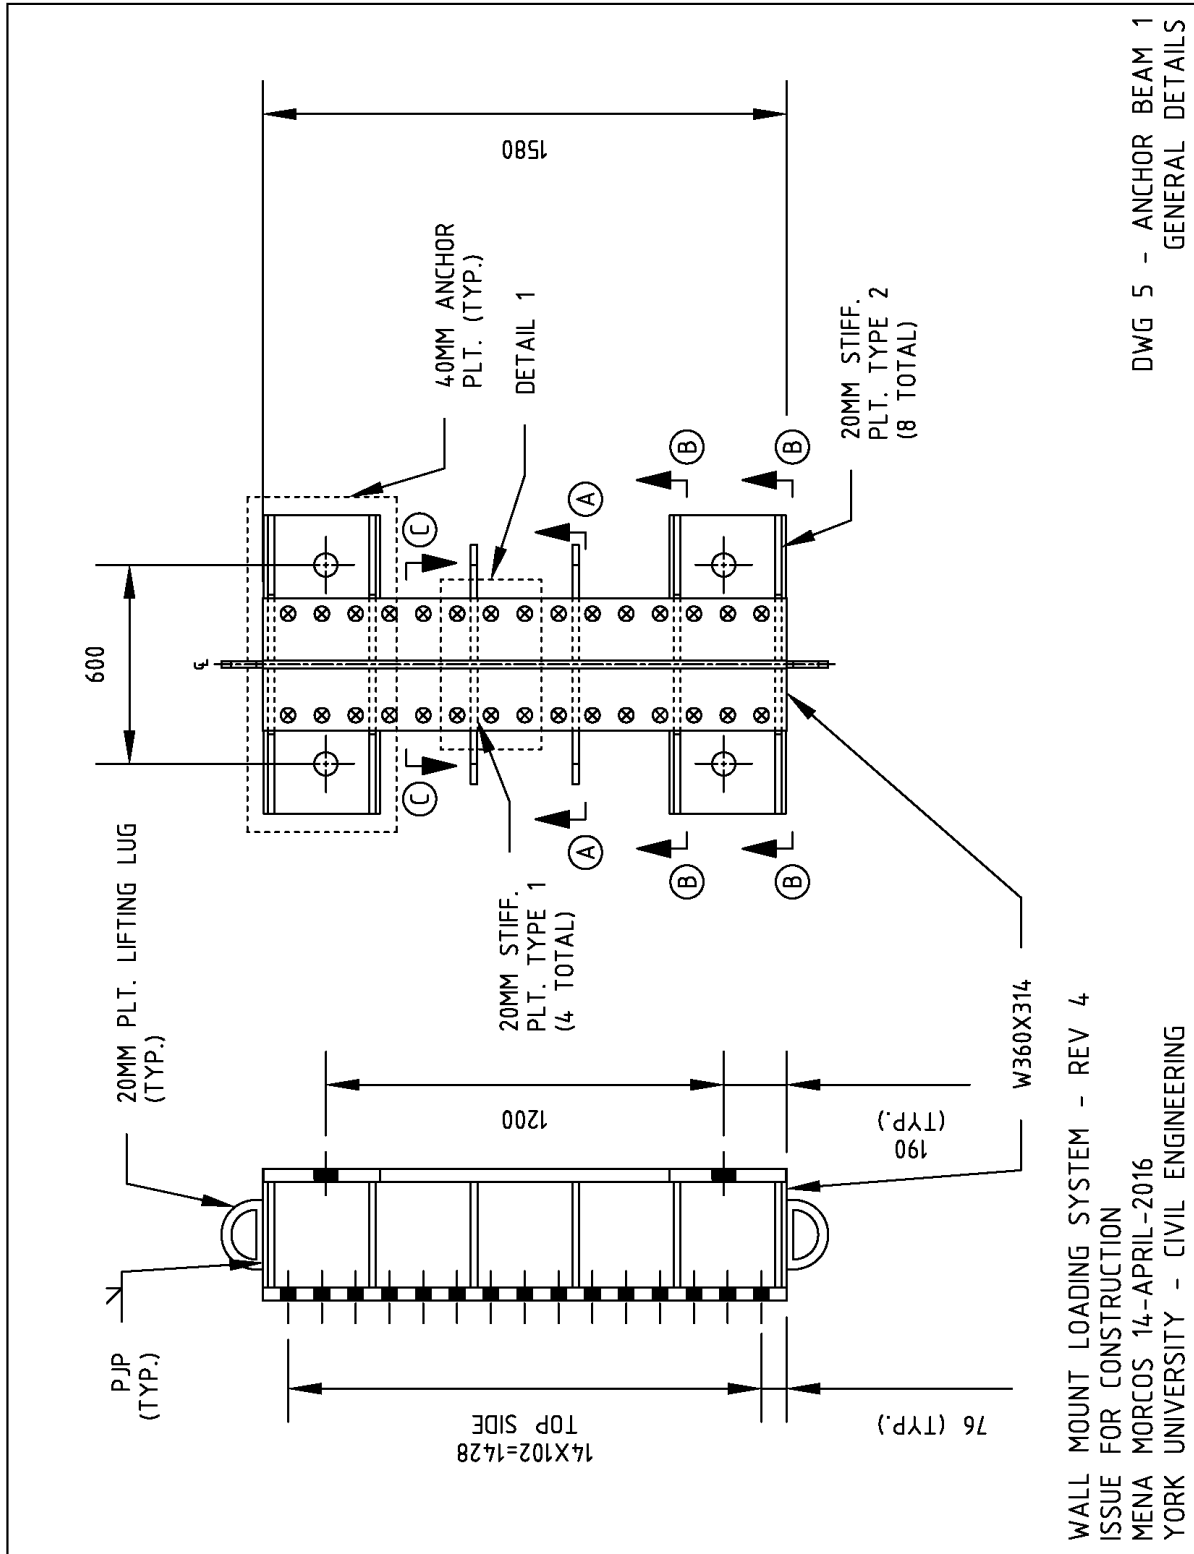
Wall mount loading system design and fabrication drawing – Drawing 5.
